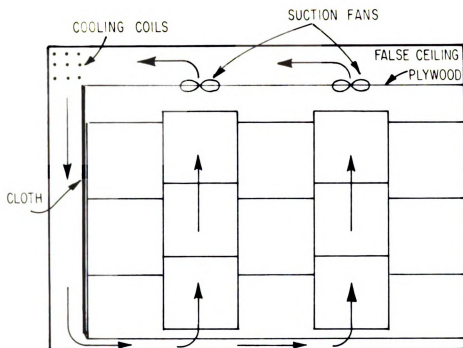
B-1. Schematic drawing of "packed-bed" room -- side view
